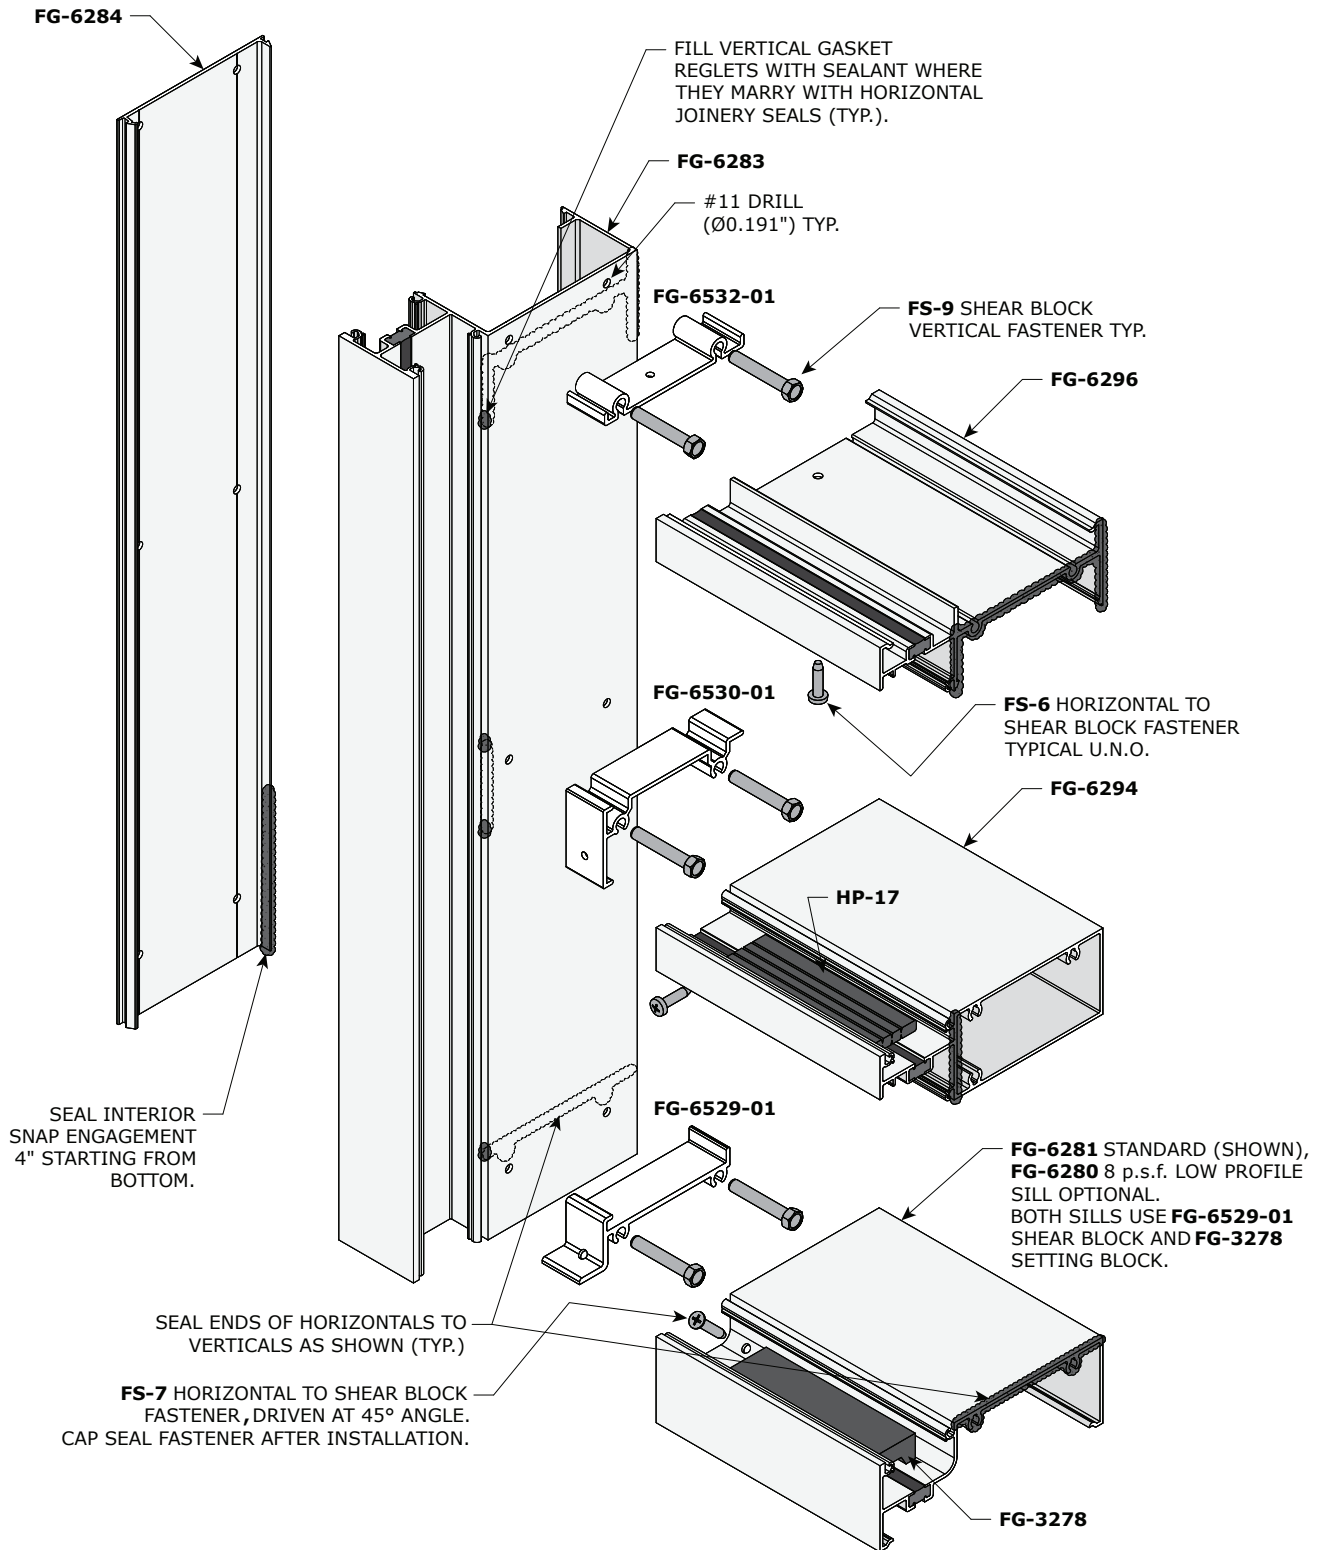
Frame Assembly - Front Set, Outside Glazed, Shear Block System
